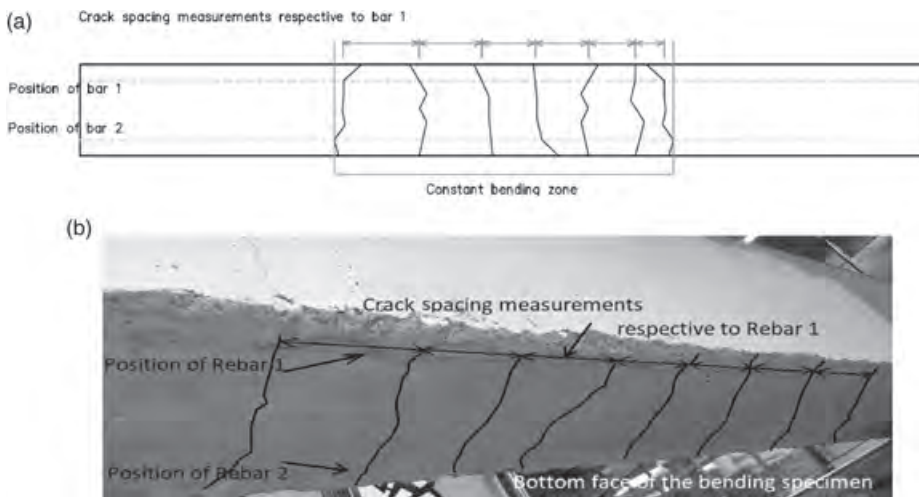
(a) Method of measuring crack spacing; (b) Crack spacing measurements at the soffit of a bending specimen
